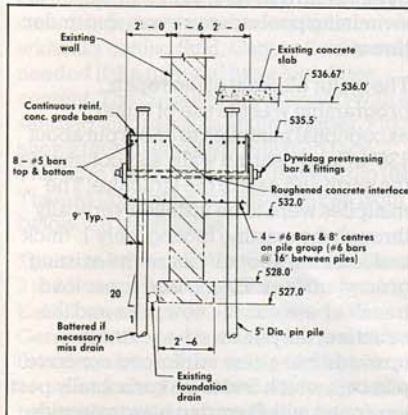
Details of attachment of minipiles to existing structure. Mid Orange Correctional Facility, Warwick, NY.
